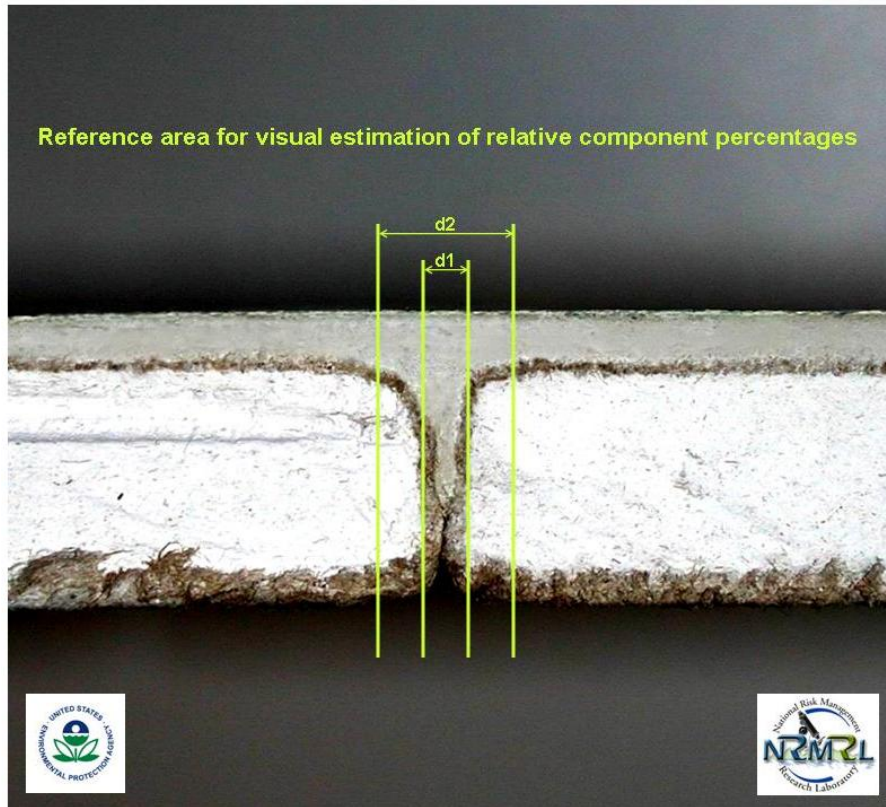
Section of 1/2-inch gypsum wallboard showing a multi-layered joint interval. Wallboard was obtained from Building #3607 (AACM)
